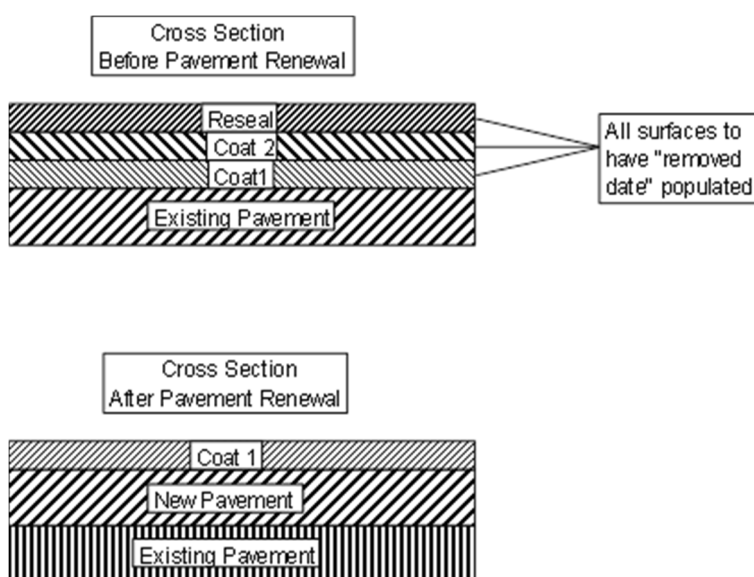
Cross-sections of Pavement and Top Surface Before and After Pavement Renewal
